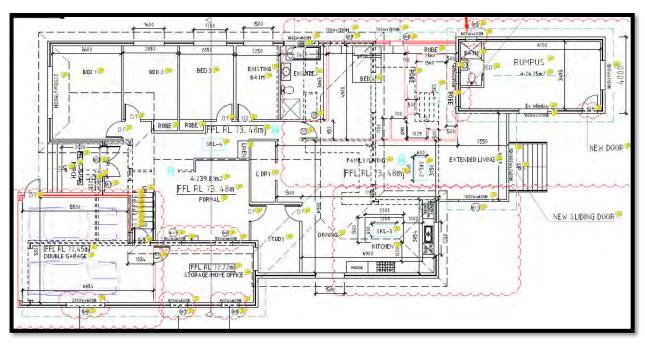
Ground floor plan of No. 38 Olive Street as approved under LDA2020/0112.
